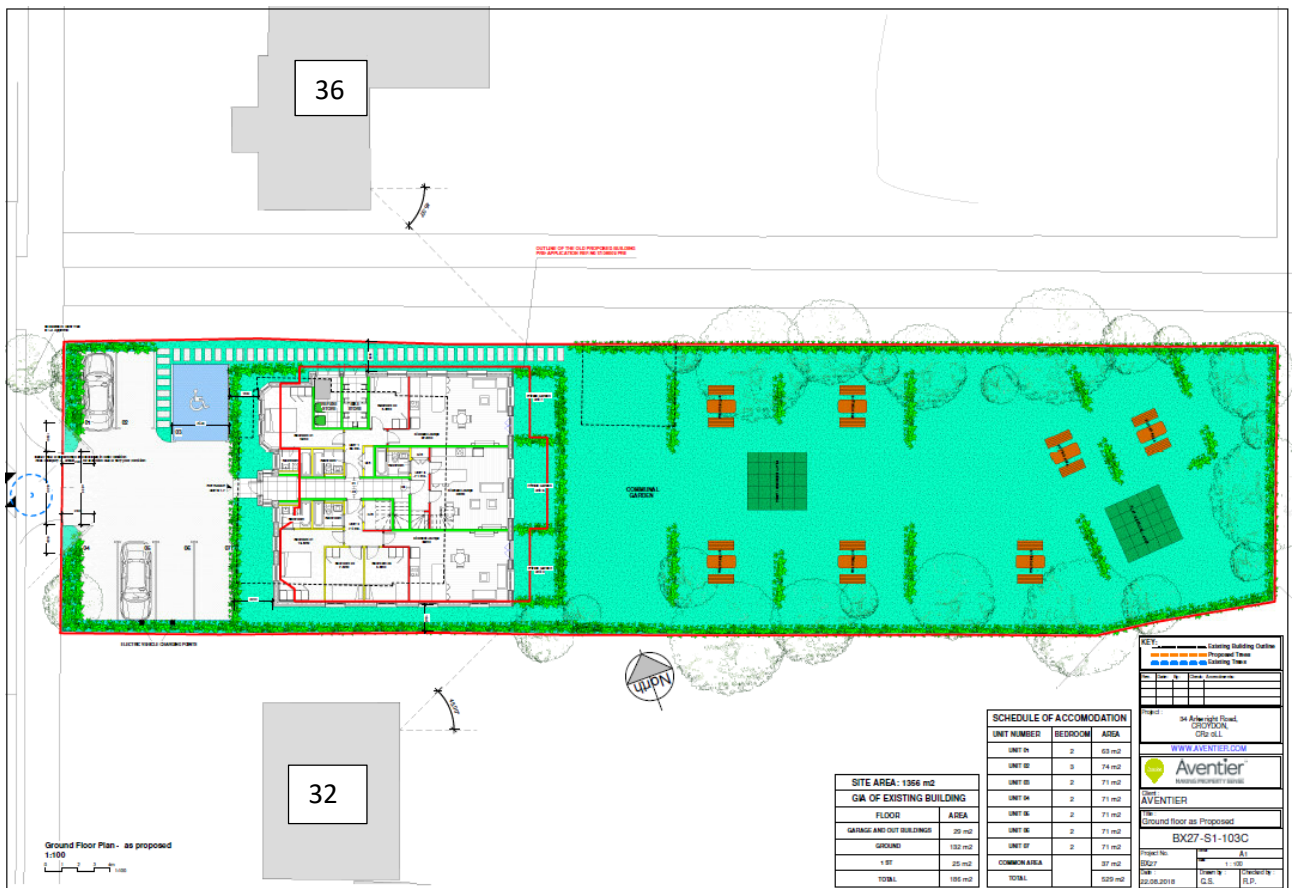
Ground floor plan highlighting the relationship with the adjoining occupiers.
